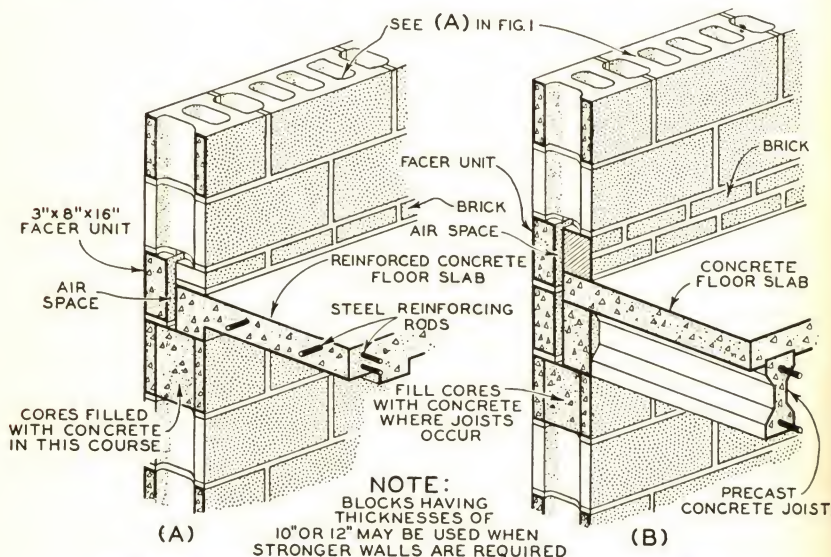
Details of Support for Concrete Floor in Masonry Wall
